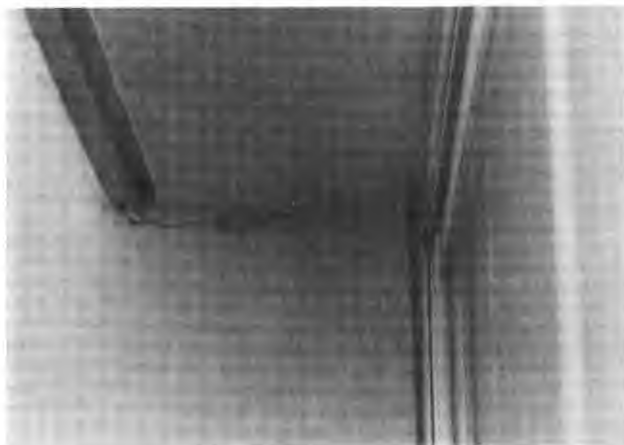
Holiday Inn, Orion Avenue. Exterior spandrel beam-to-column connection. Shallow cracking at column pour joint. General Adjustment Bureau photograph.
